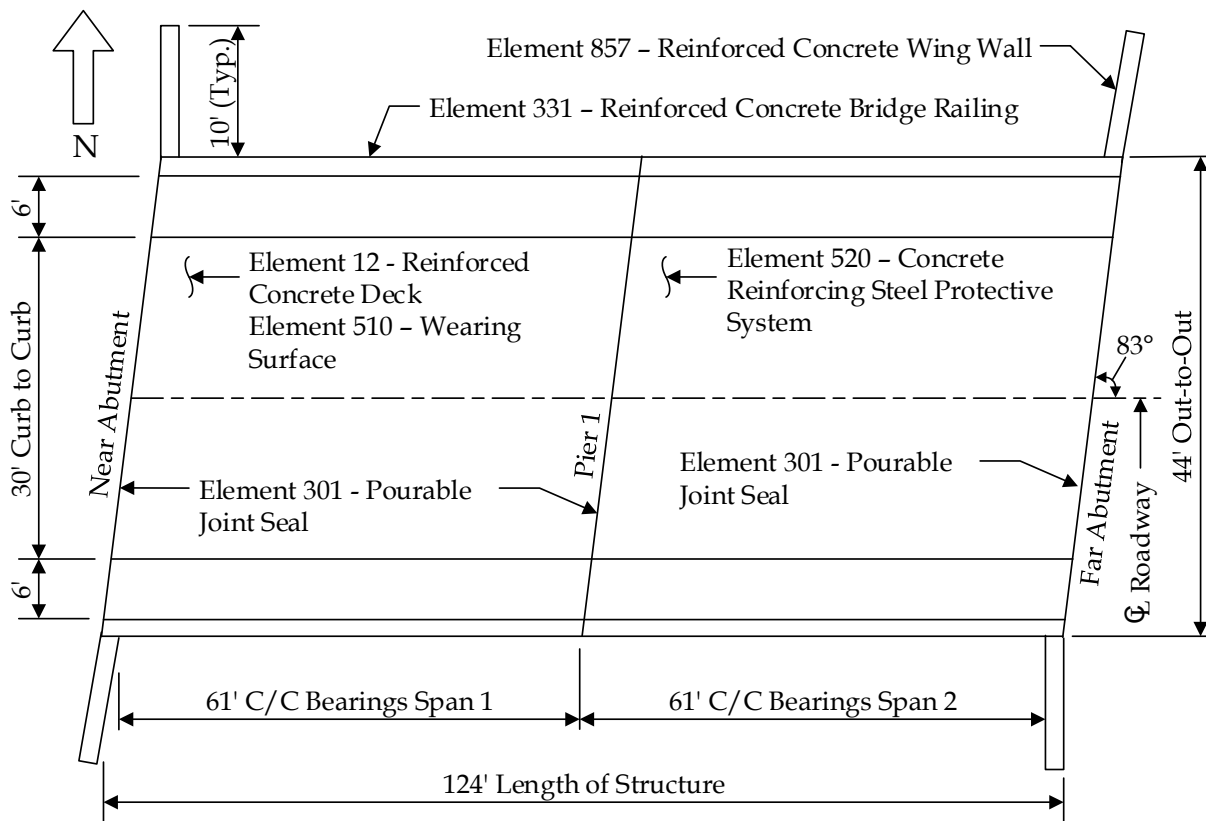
Plan View of Steel Multi-Beam Bridge
